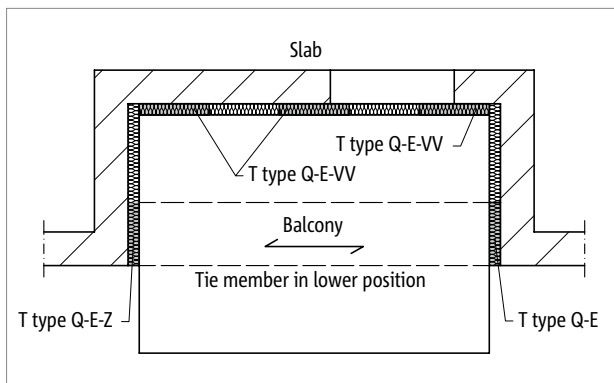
Schöck Isokorb® T type Q-E, Q-E-Z and Q-E-VV: Recessed balcony supported on three sides with tie member
